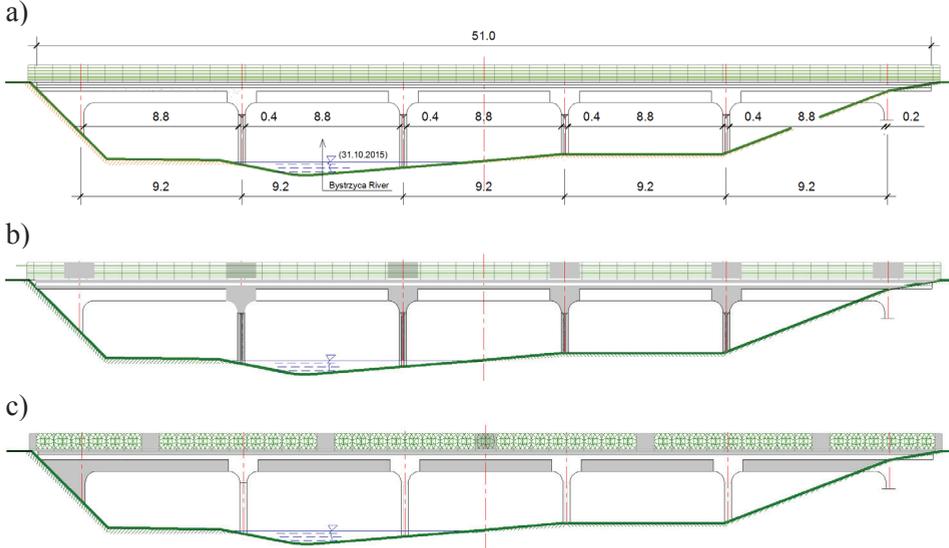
Possible revitalizing actions of the First Lutoslawski Bridge a) current view b) pilastring c) anti-pilastring
